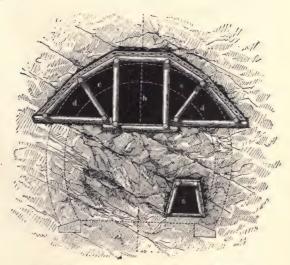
TIMBERING FOR TUNNEL HEADING.
